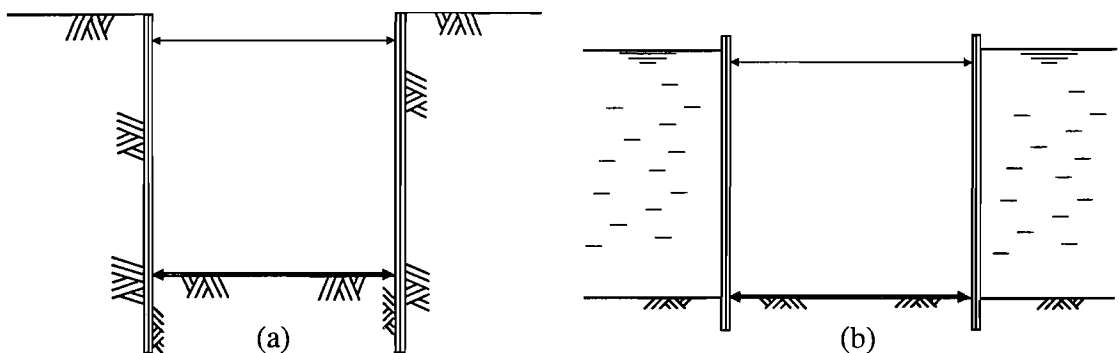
Cofferdam style retaining wall under soil (a) and hydrostatic (b)
